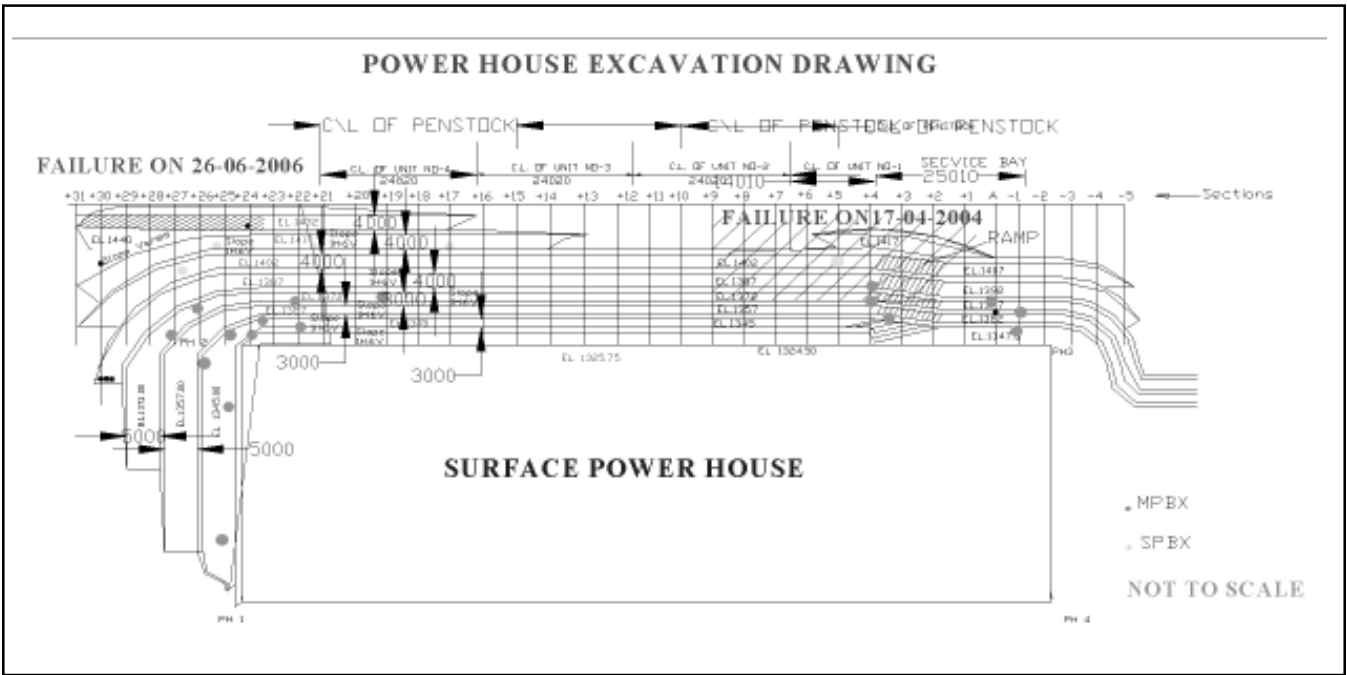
Layout of Power House Slope Parbati H.E. Project Stage – II.
